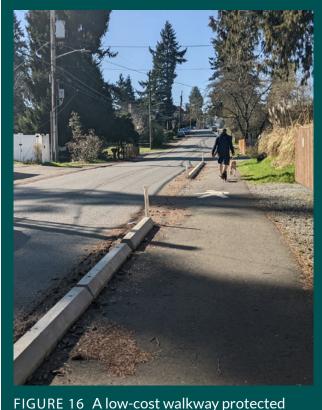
A low-cost walkway protected with precast concrete barriers in Seattle, WA. Source: Toole Design
